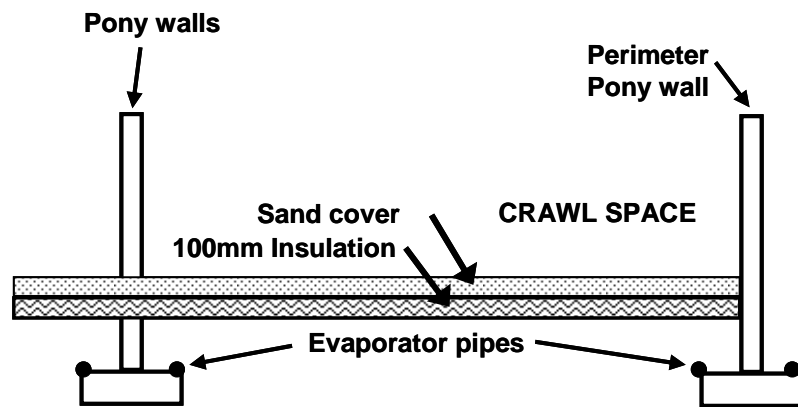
Schematic of Rankin Inlet School thermosyphon foundation design
